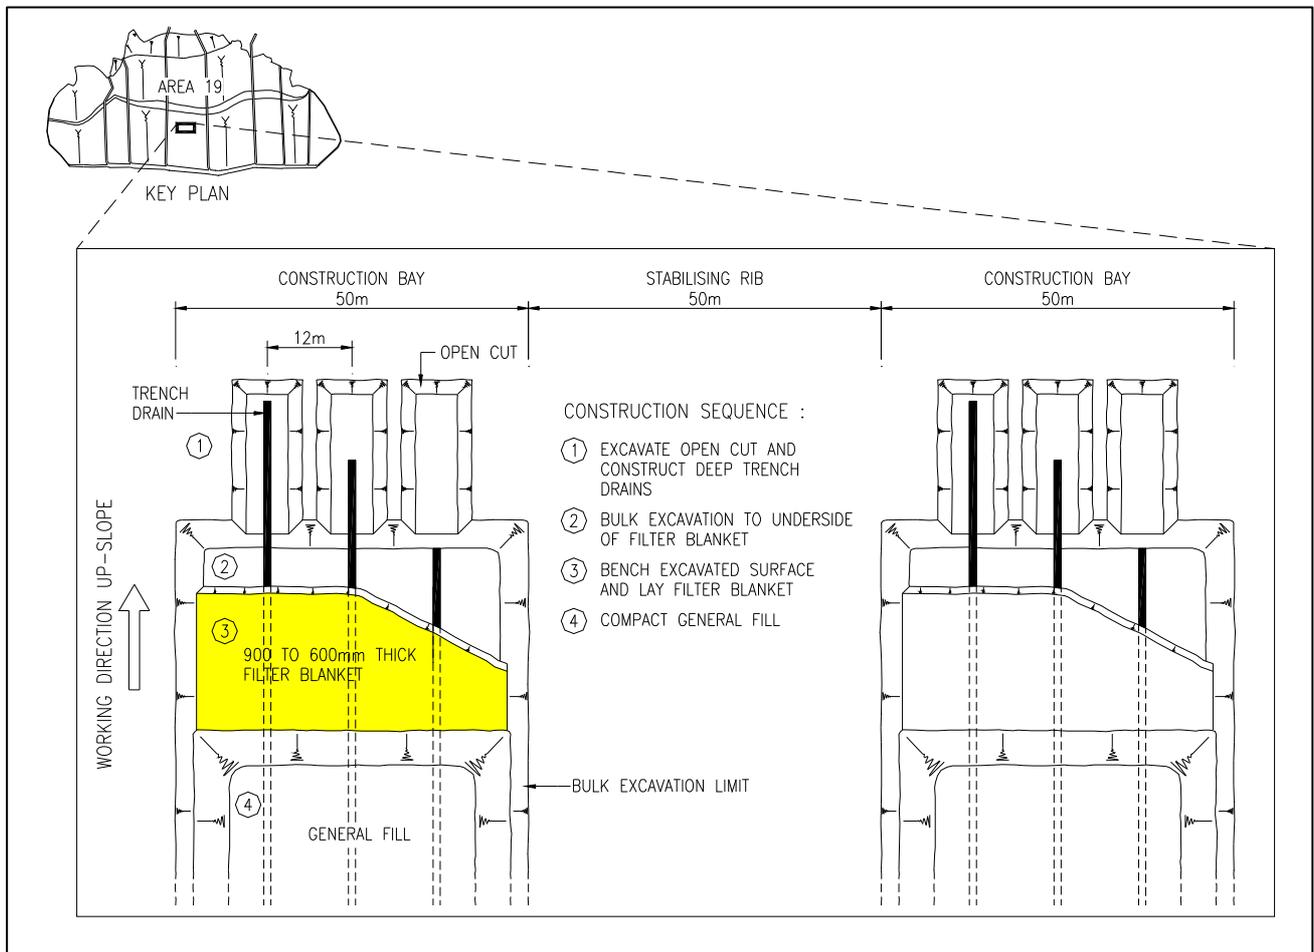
Construction sequence in Area 19 to prevent large scale instability during bulk excavation, trench drain installation and filling works.
